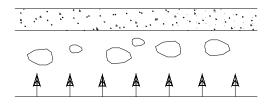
TRANSFER OF WHEEL LOAD TO FOUNDATION IN RIGID PAVEMENT STRUCTURE.
